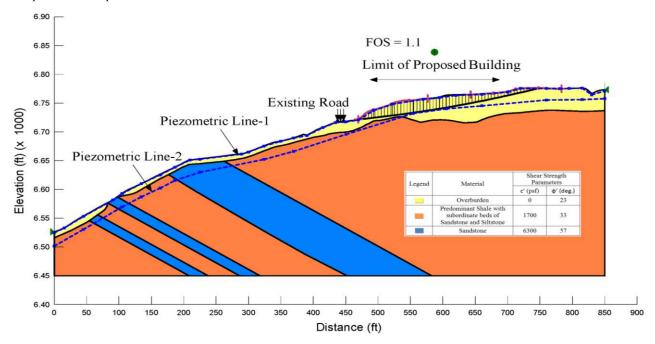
Existing Slope Section 2-2' - Critical Failure Surface through Overburden
